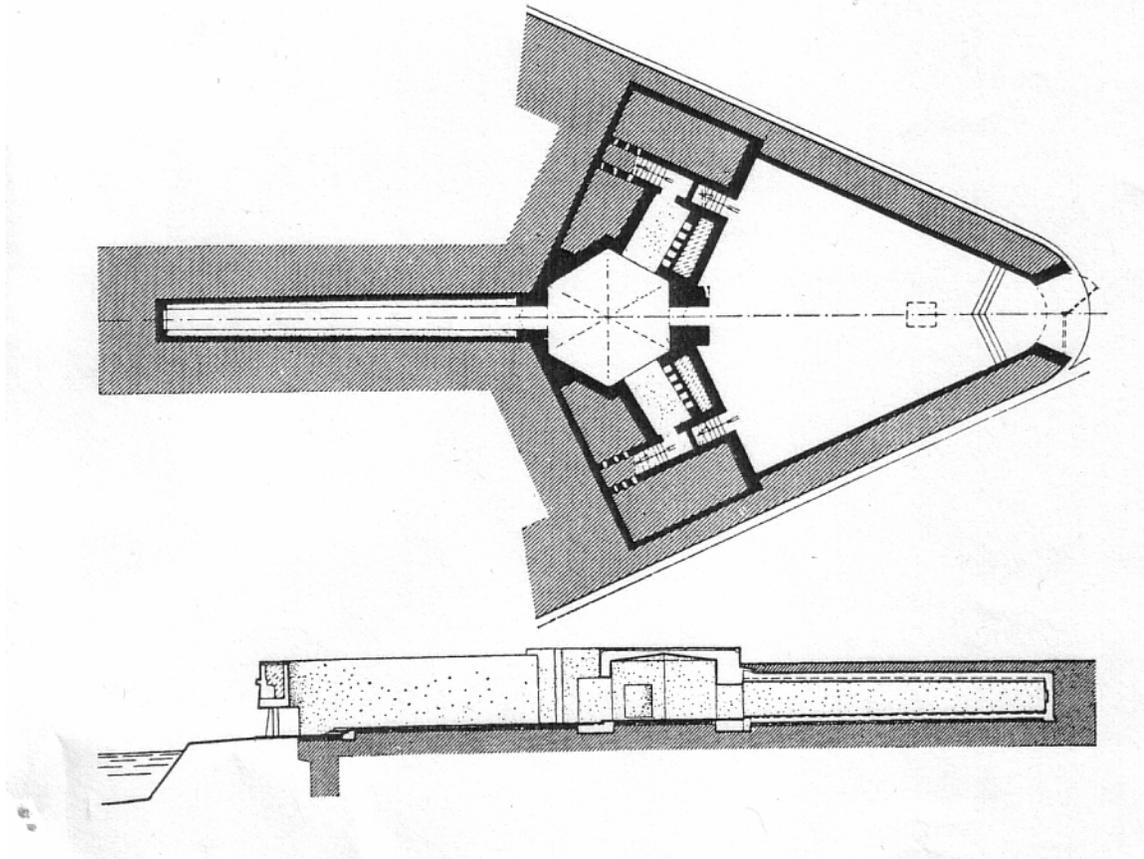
Memorial for the Deported, Plan and Longitudinal Section
